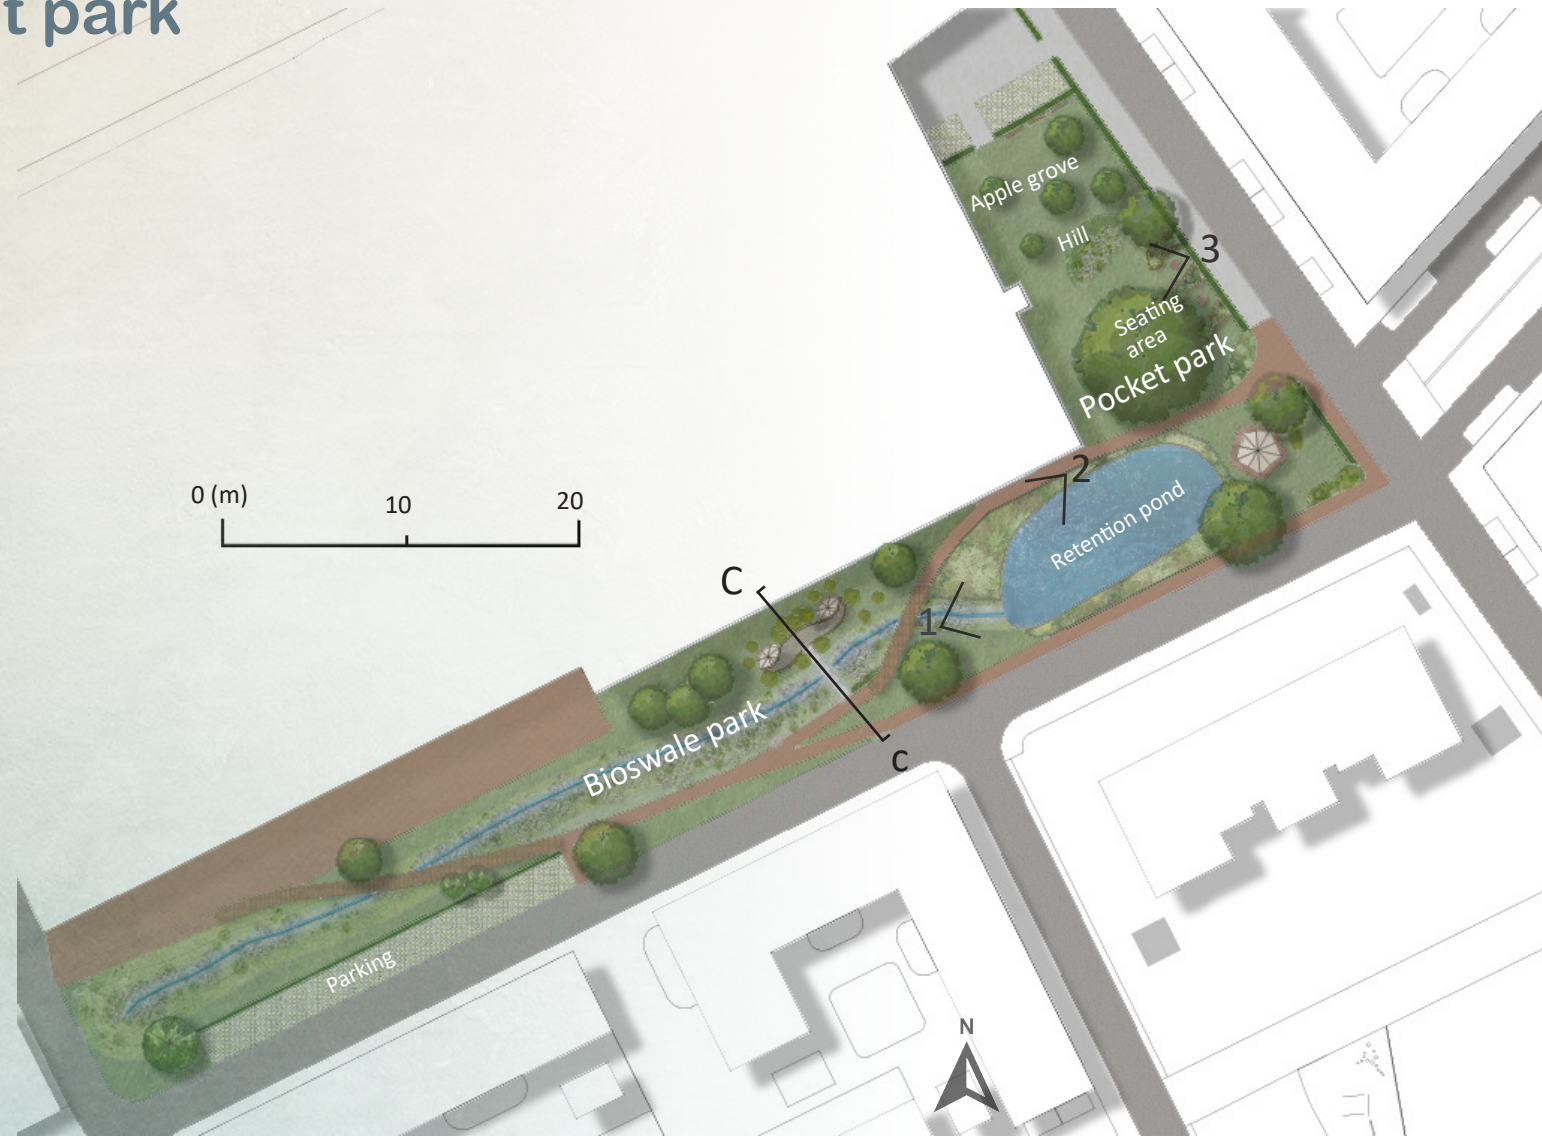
Plan over the Bioswale park and Pocket park. (Lewin and Härstedt, 2021)
